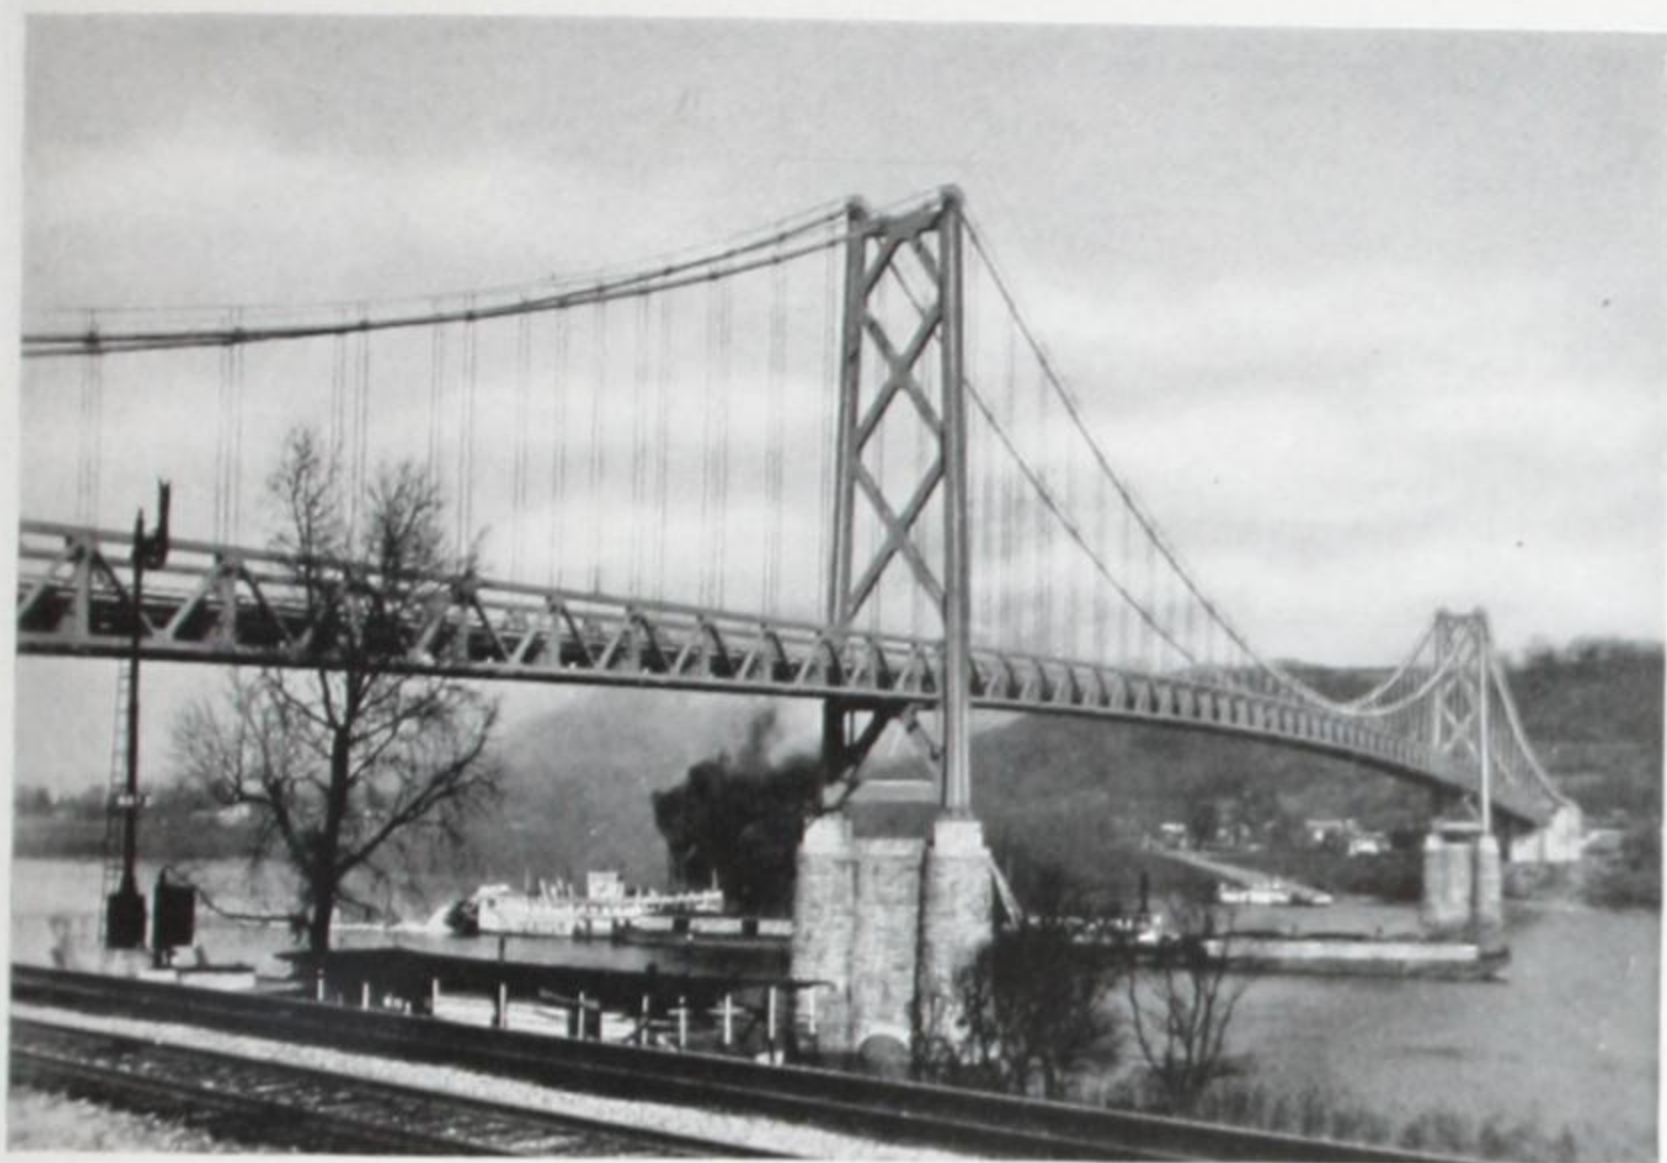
Maysville—An inter-state bridge—between Maysville, Ky., and Aberdeen, Ohio. It is the second largest highway bridge to be suspended from Prestressed Parallel Strand Cables. Its two traffic lanes and one sidewalk constitute an important factor in the transportation facilities of this section, where here, as pictured, water, rail, motor and if the camera had snapped a second later, air—each plays its part in meeting the needs of modern travel and industry.
